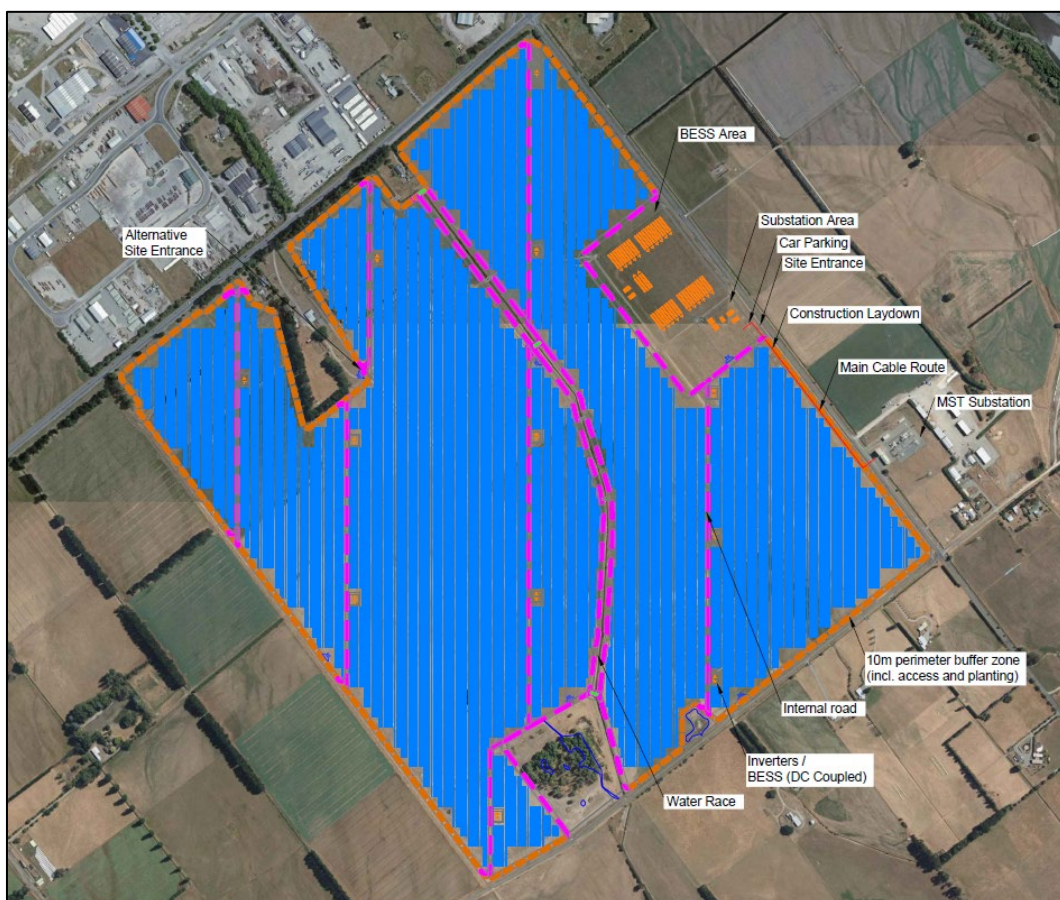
Proposed site plan (NZ Clean Energy, Appendix 3).
